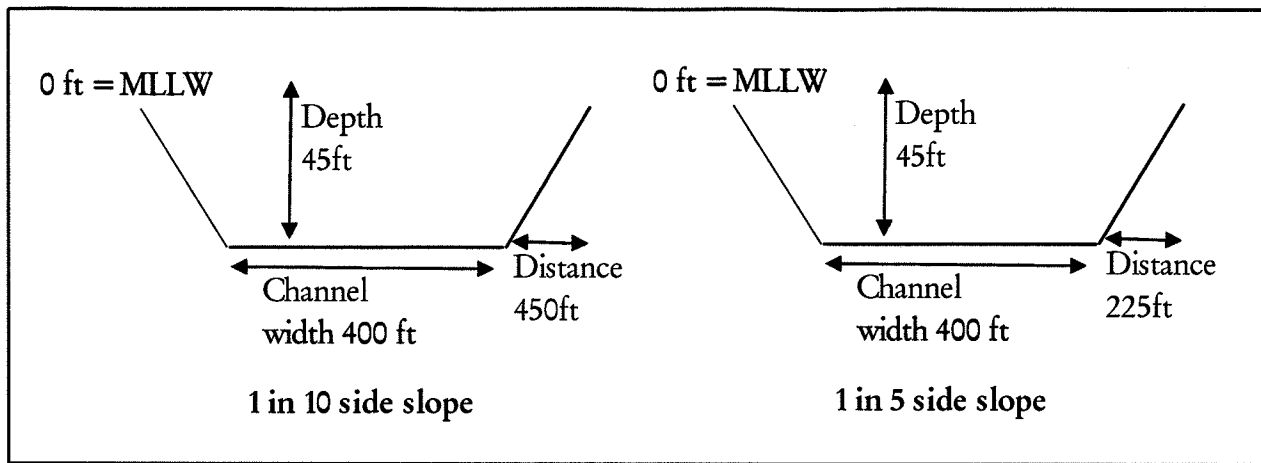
Schematic cross section of the proposed dredge model (1:10 and 1:5 side slopes)
